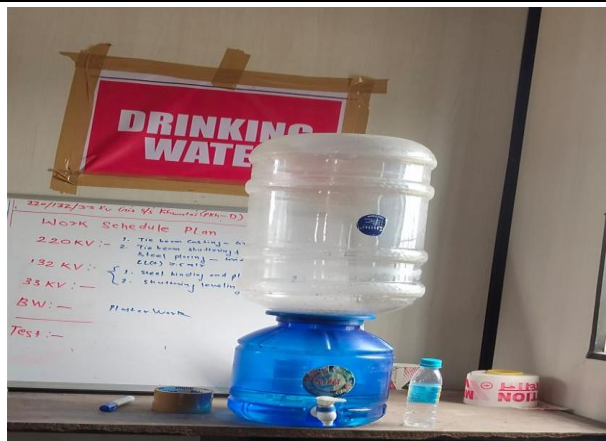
Drinking water facility provided at Khumtai S/S
